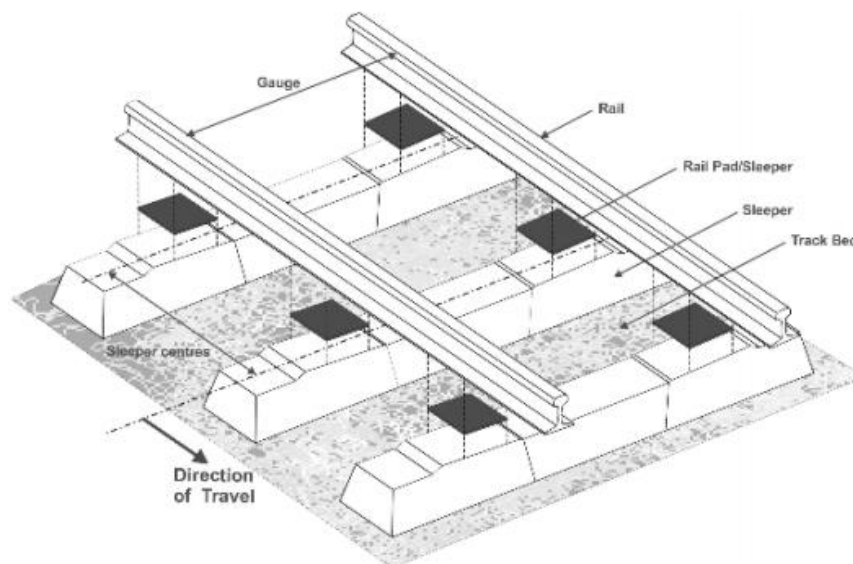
Typical Ballasted Railway Track (Remennikov et.al 2008)
